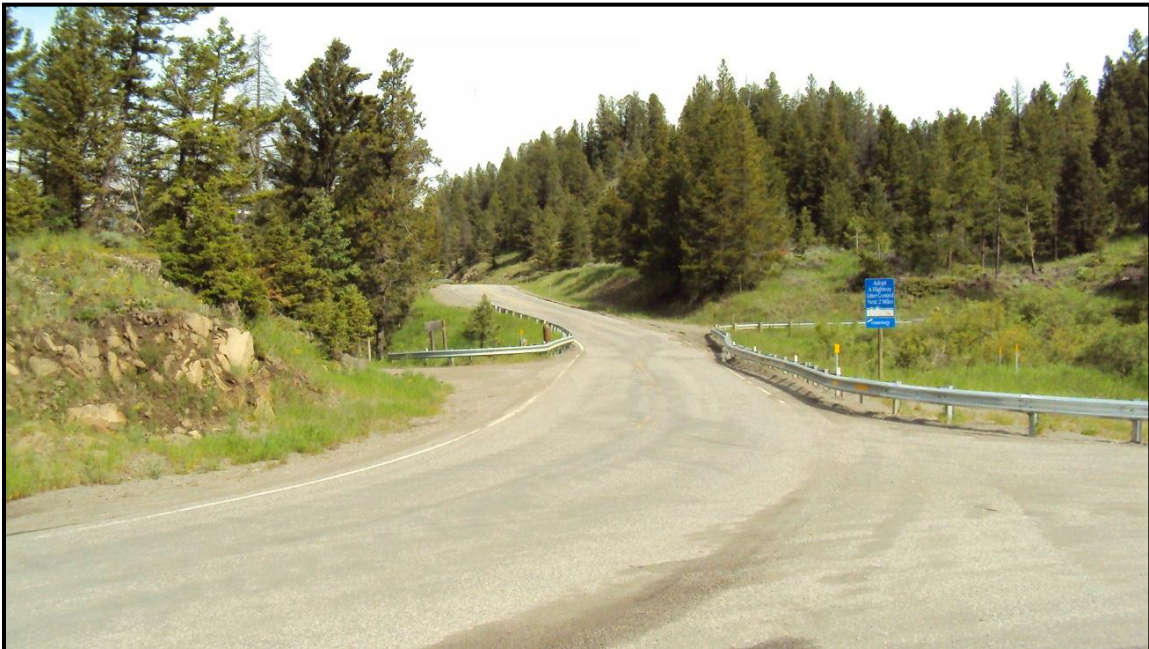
Looking at pavement deterioration on MT 86. RP 14.3.
